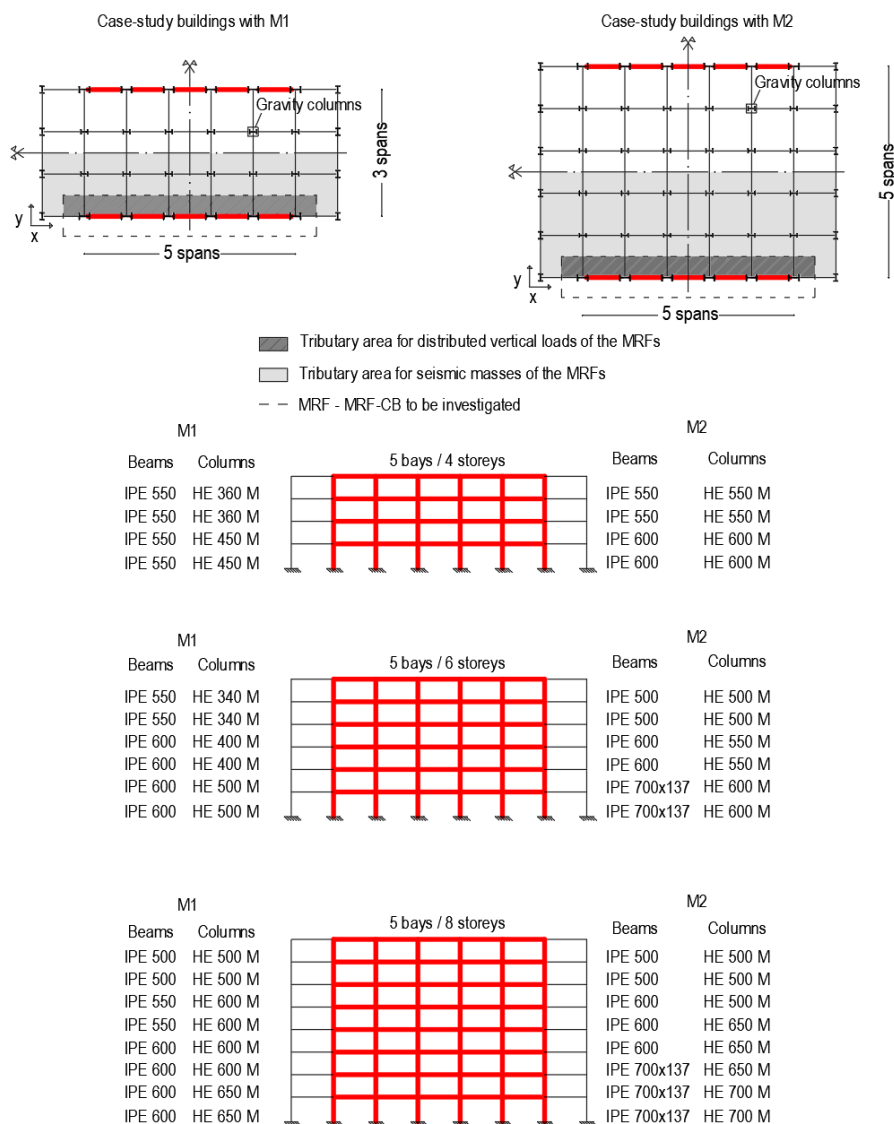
(a) Plan and (b) elevation views of the case-study buildings.
